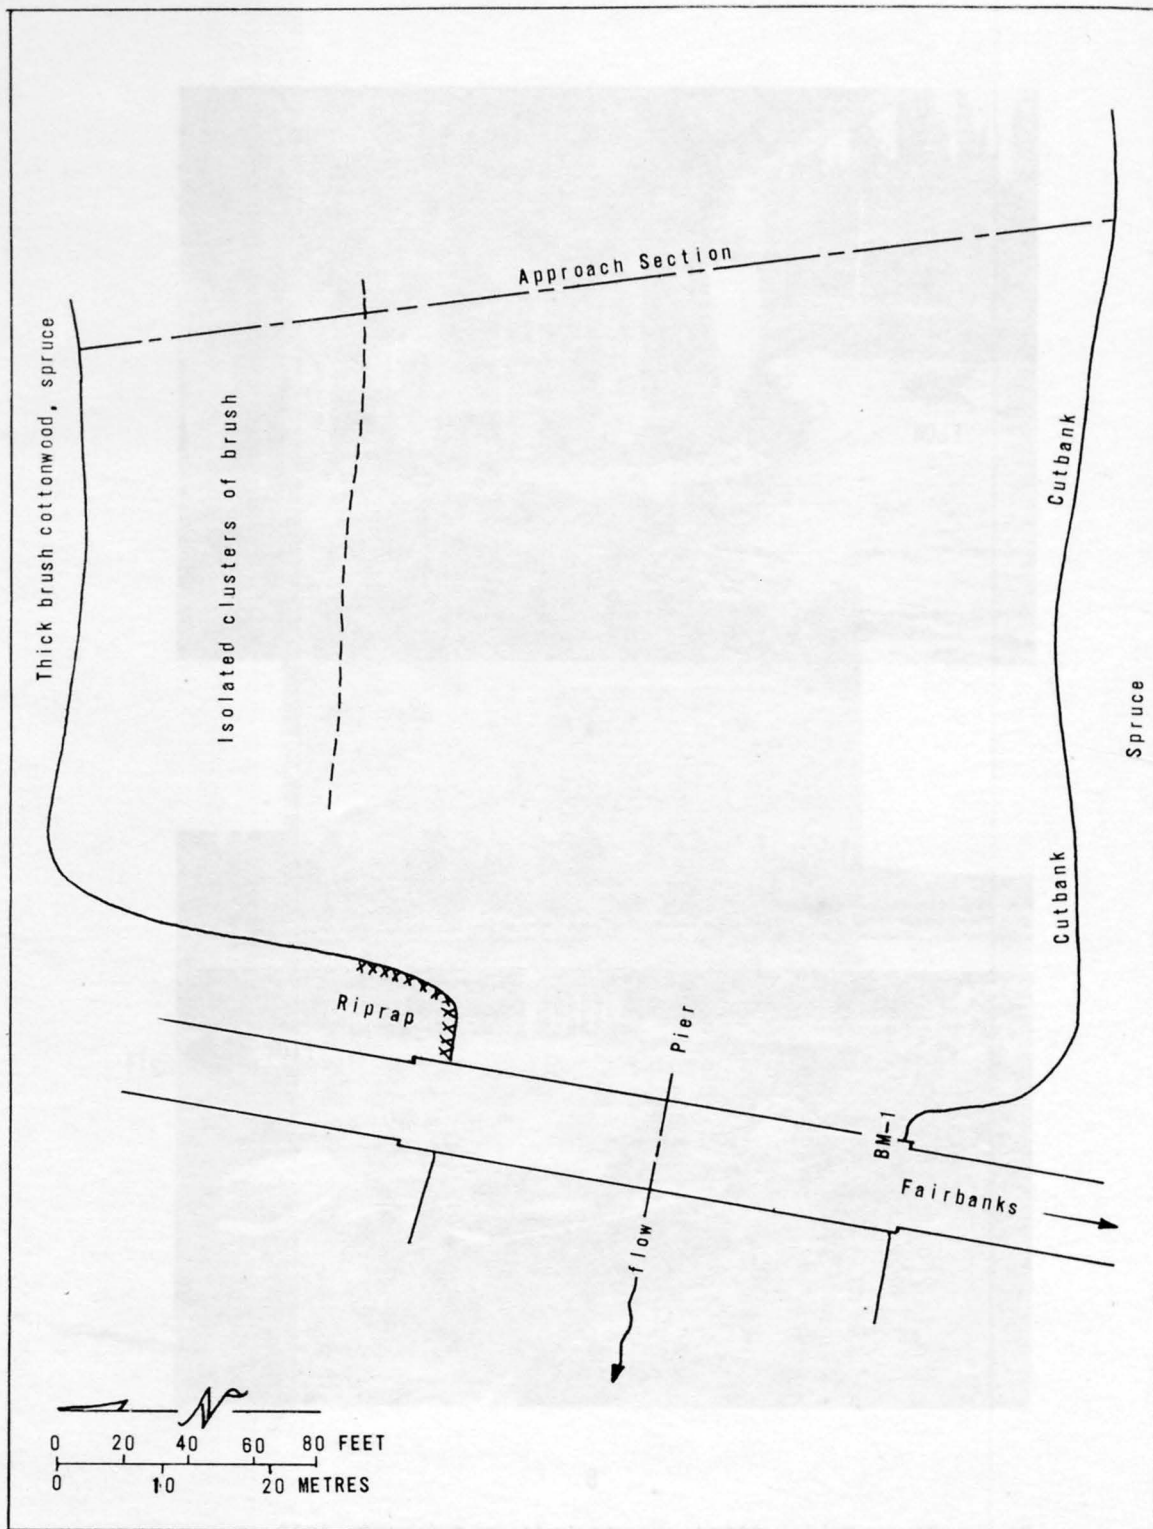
Plan view of Chena River near Two Rivers at bridge 233.
